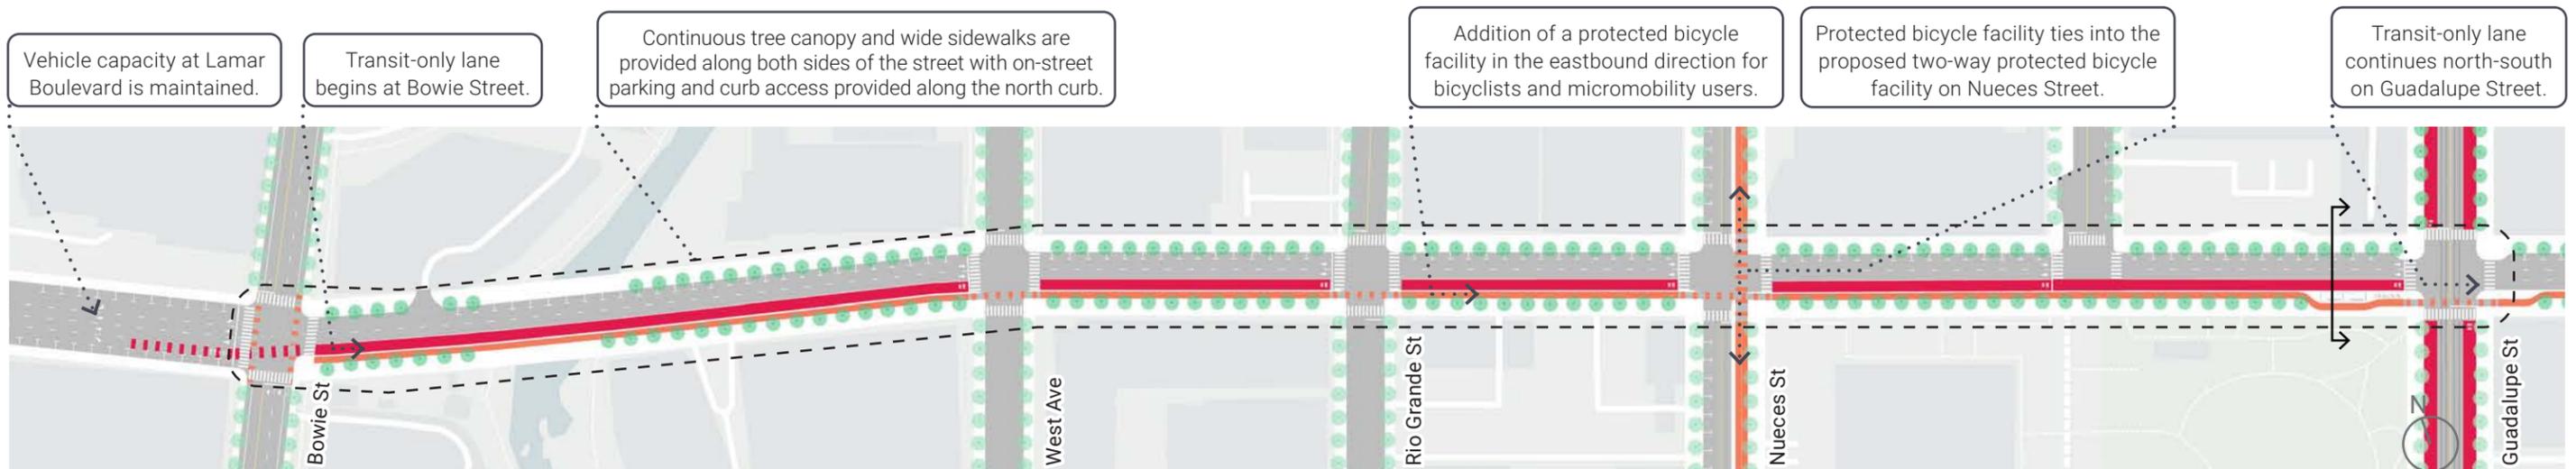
Fifth Street schematic Bowie Street to Guadalupe Street
